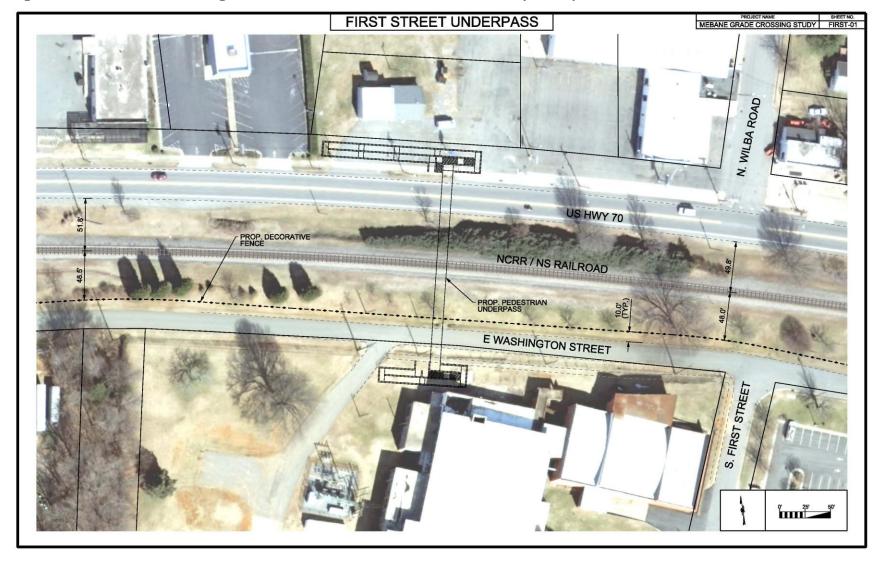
Pedestrian Crossing near S. First Street/N. Wilba Road – Underpass Option Recommendation
